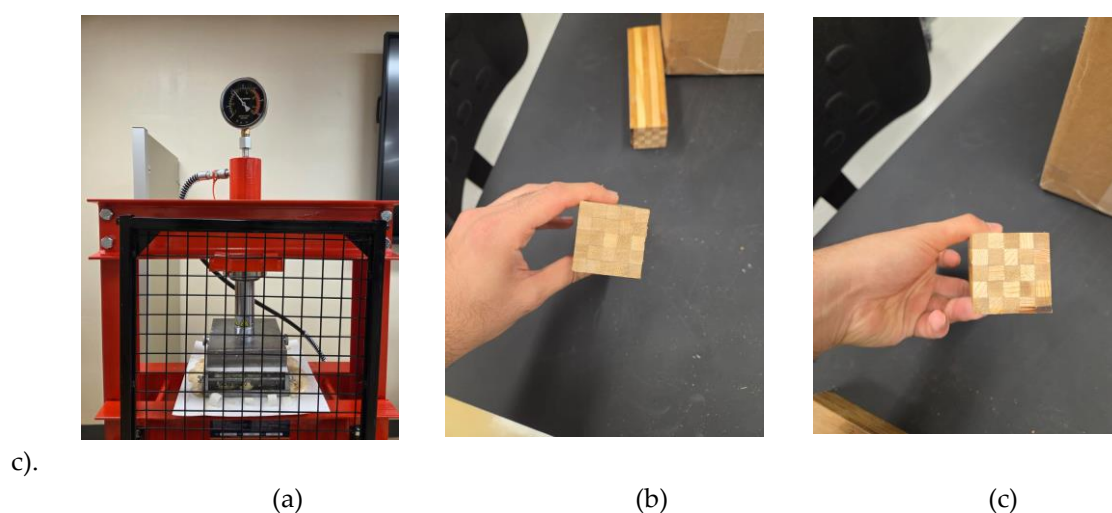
Specimen manufacturing: (a) cold-press lamination of the specimens under hydraulic loading, (b) cross-sectional view of the laminated bamboo specimen, BPA, and (c) cross-sectional view of the hybrid bamboo-timber specimen, CPA.
